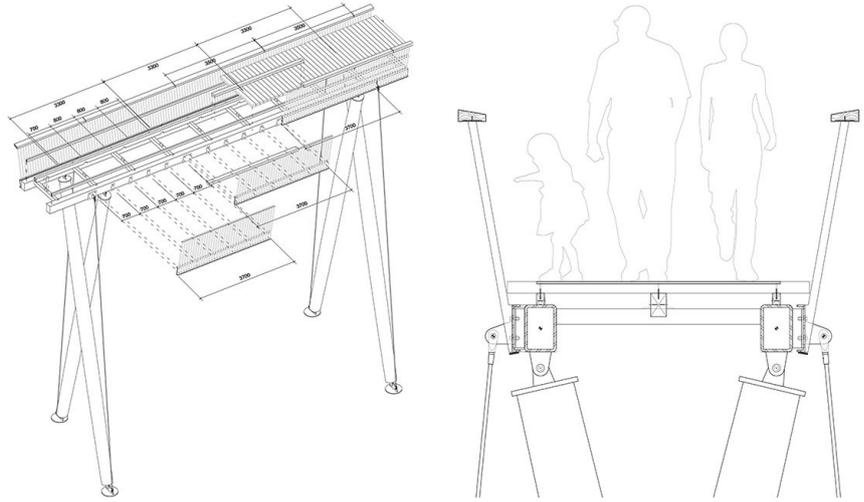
Glenn Howells Architects. 2017. *STIHL Treetop Walkway construction details*.
